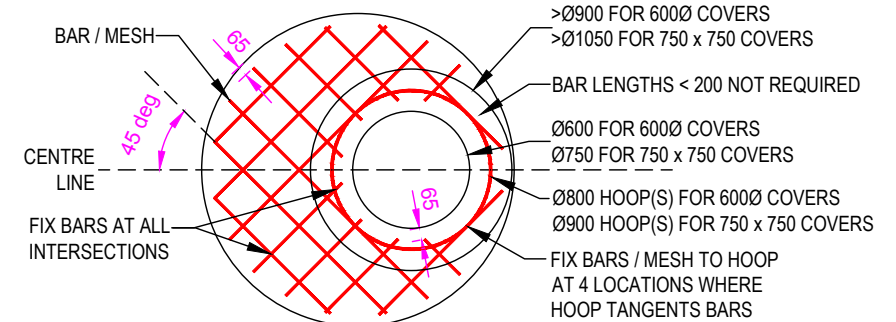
B: FLAT TOP REINFORCEMENT ARRANGMENT (PLAN VIEW)
